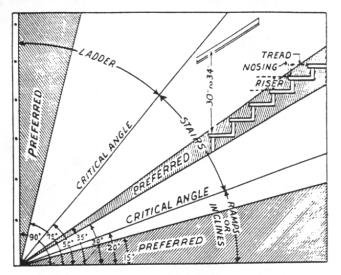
Preferred angles for fixed ladders, stairs and ramps.
